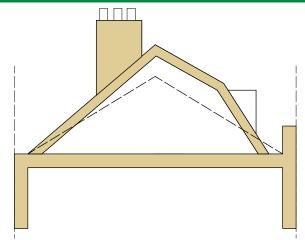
A double pitch mansard roof should have two slopes, the lower face should be steeply pitched and the upper slope should have a more shallow pitch. We would expect this traditional style Mansard within Conservation Areas where
